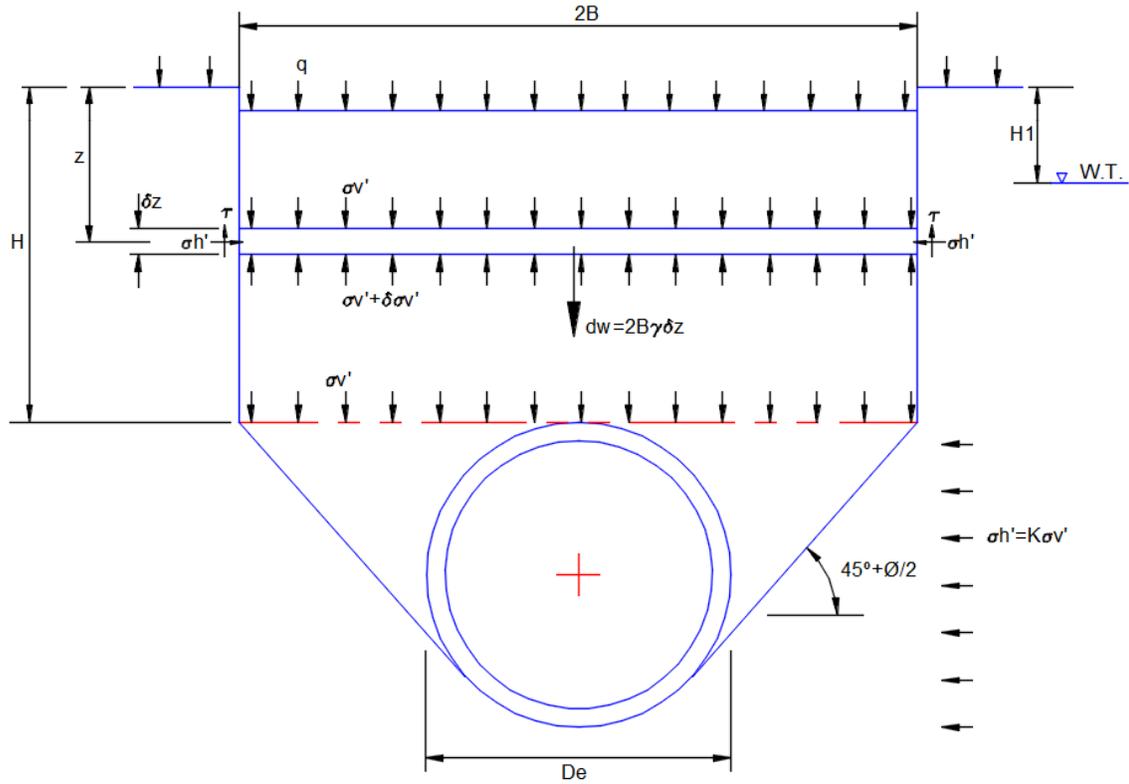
Ground loading from Auld model. Modified from (Milligan and Norris, 1999)
